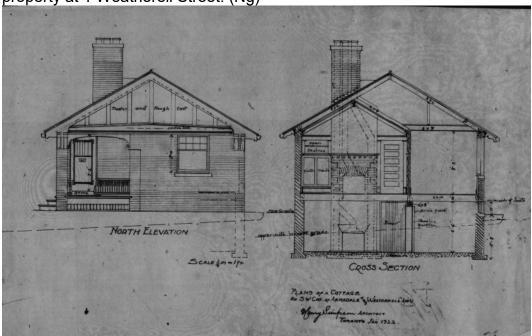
Original architectural drawing by Henry Simpson showing the north elevation (left) and section (right) of the property at 1 Weatherell Street. (Building Records)
